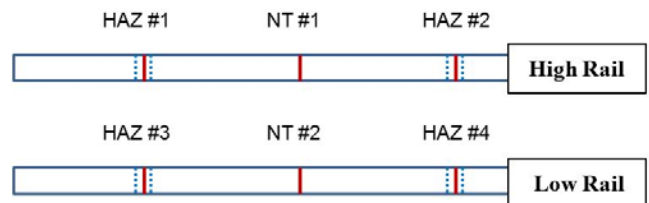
Diagram showing locations of six test welds installed at FAST. NT represents the not treated control welds and HAZ represents the HAZ overlay treated welds
